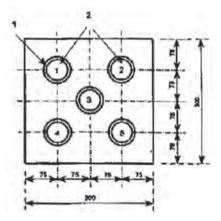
View of the sample for testing with the arrangement of the discs, dimensions in millimeters; 1 – ring around the test site, formed during drilling, 2 – steel or aluminum discs with a diameter of 50 mm [15]
